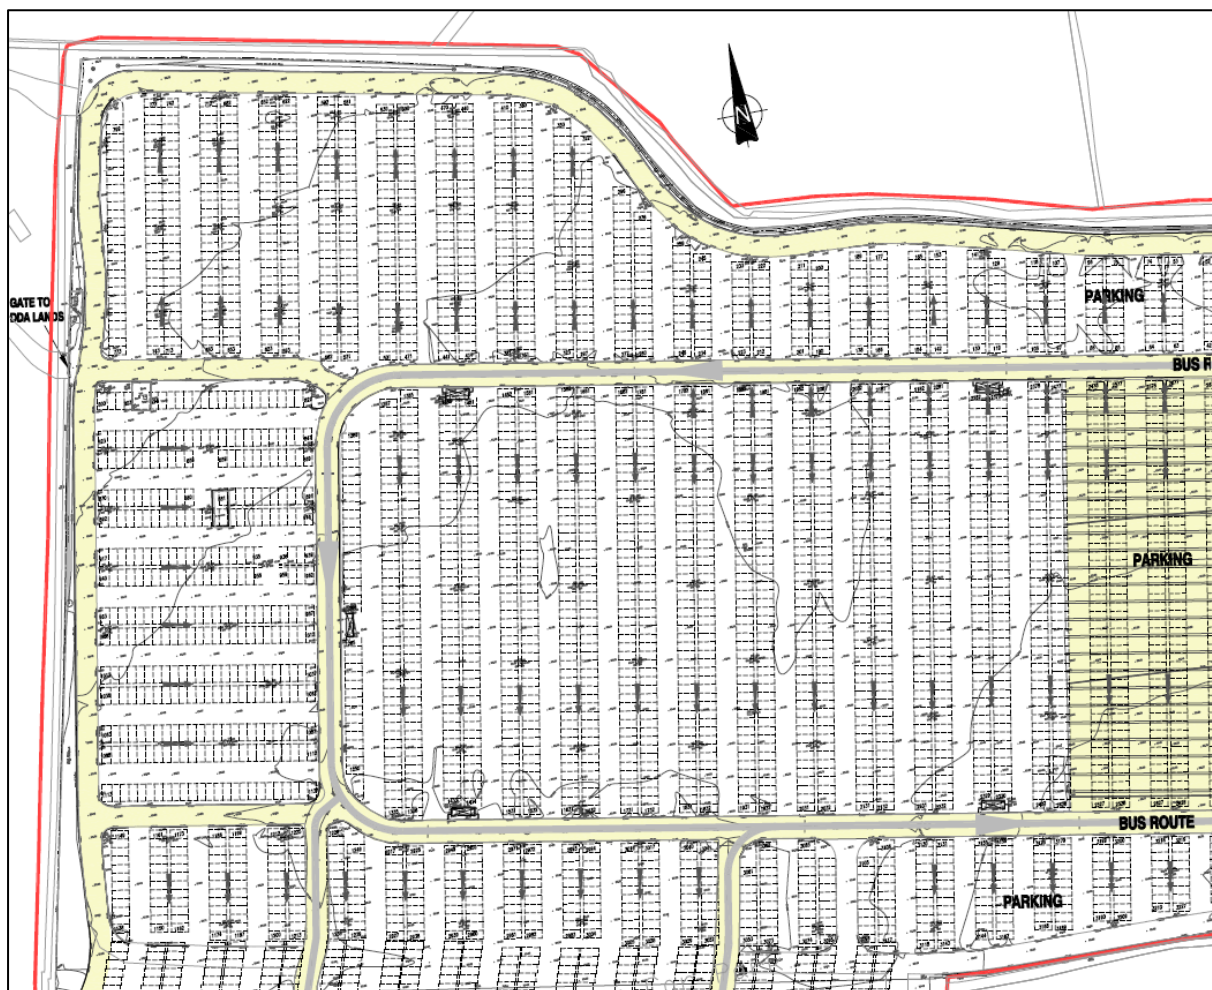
Existing and Proposed Car Park Layout (to the north)
